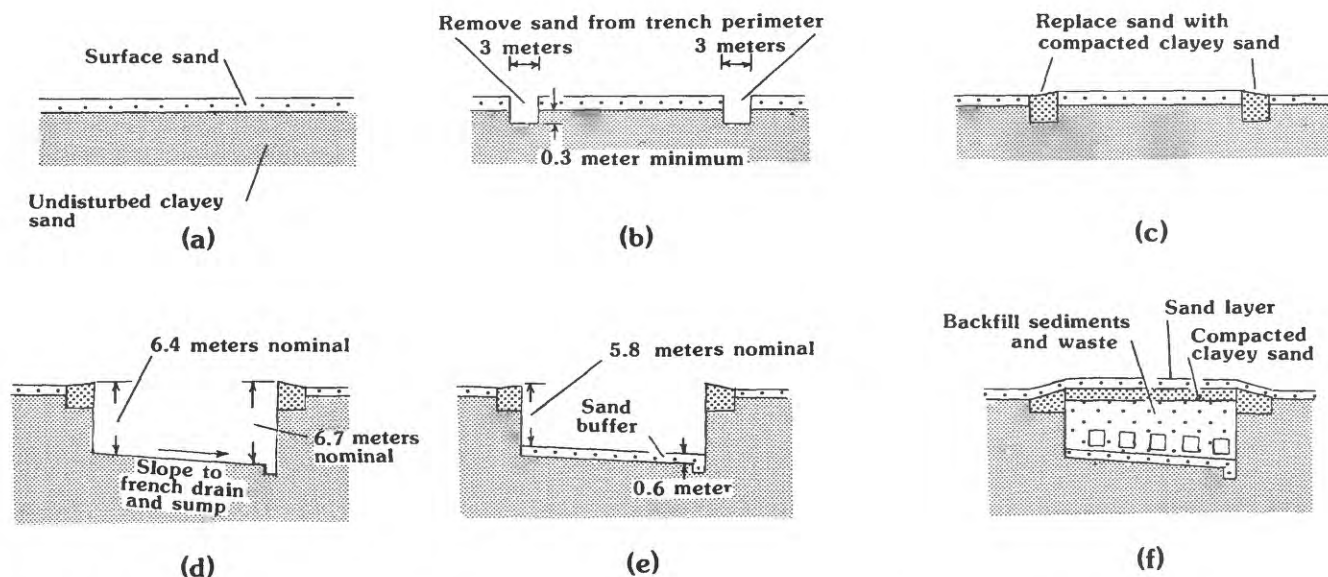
Post-1976 trench construction details: (a) pre-construction, (b) removal of surface sand from trench perimeter, (c) replacement of sand with compacted clayey sand, (d) trench excavation, (e) addition of sand buffer, (f) completion of trench.
